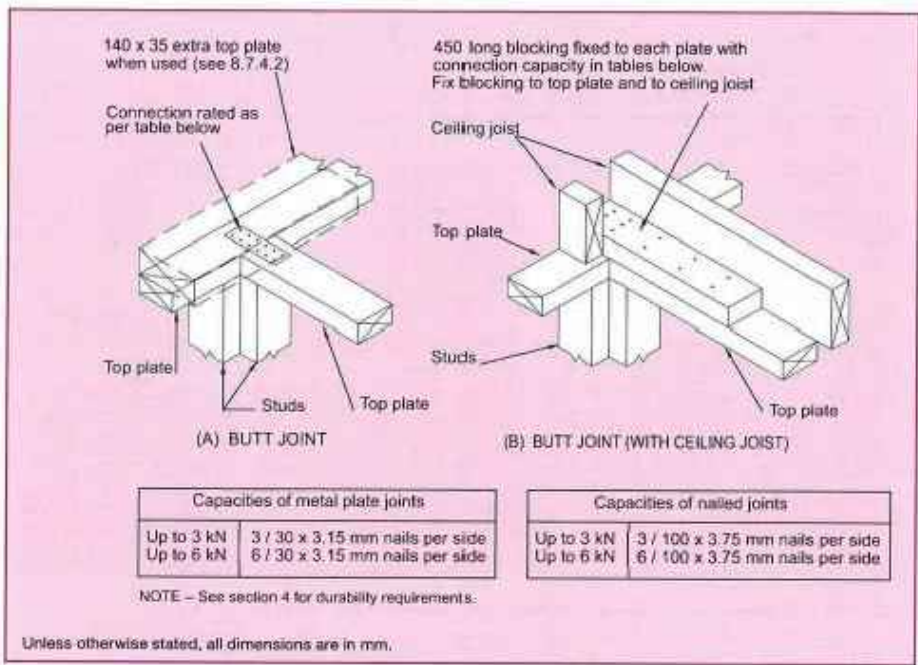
Connecting top plates to external walls at right angles – Walls containing bracing (see 8.7.3.4)
